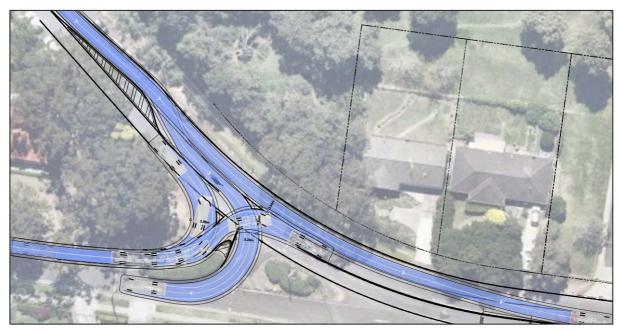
| Concept plan for seagull arrangement at intersection of Browns Road and The Comenarra Parkway (base image source: Amended Modification Applications, May 2022)
